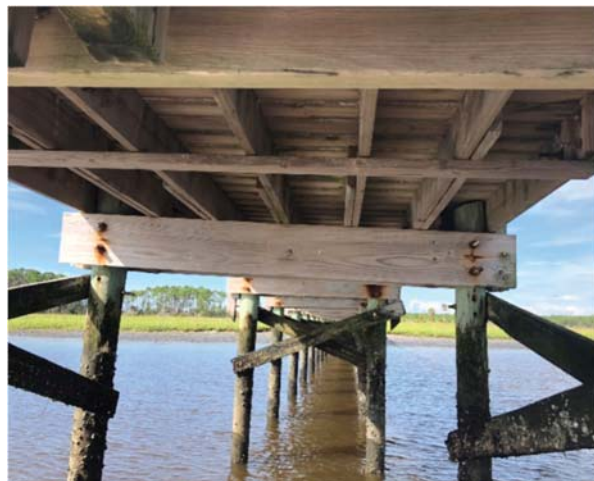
Missing lateral bracing at the fishing pier terminus platform
